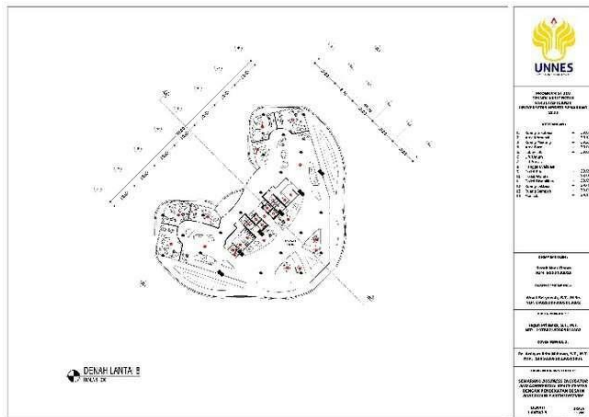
5<sup>th</sup> Floor Plan
